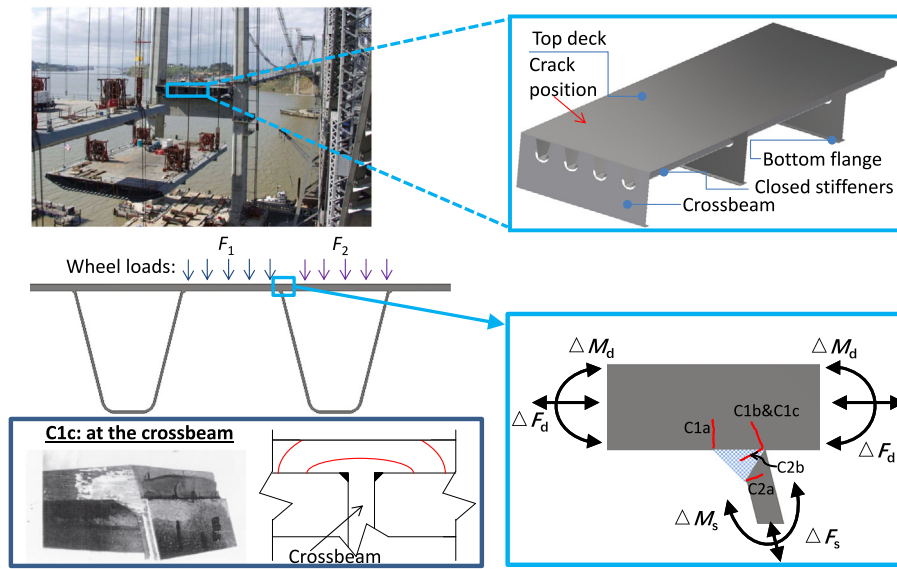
Construction photo of an OBD and illustrations of stiffener-to-deck cracks.
